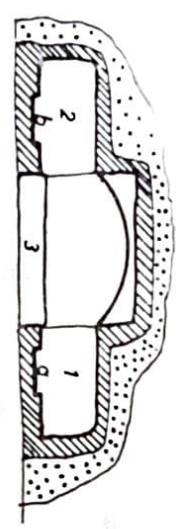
Plan and Sections of Tomb A - Saif Hussein - (شكر)
